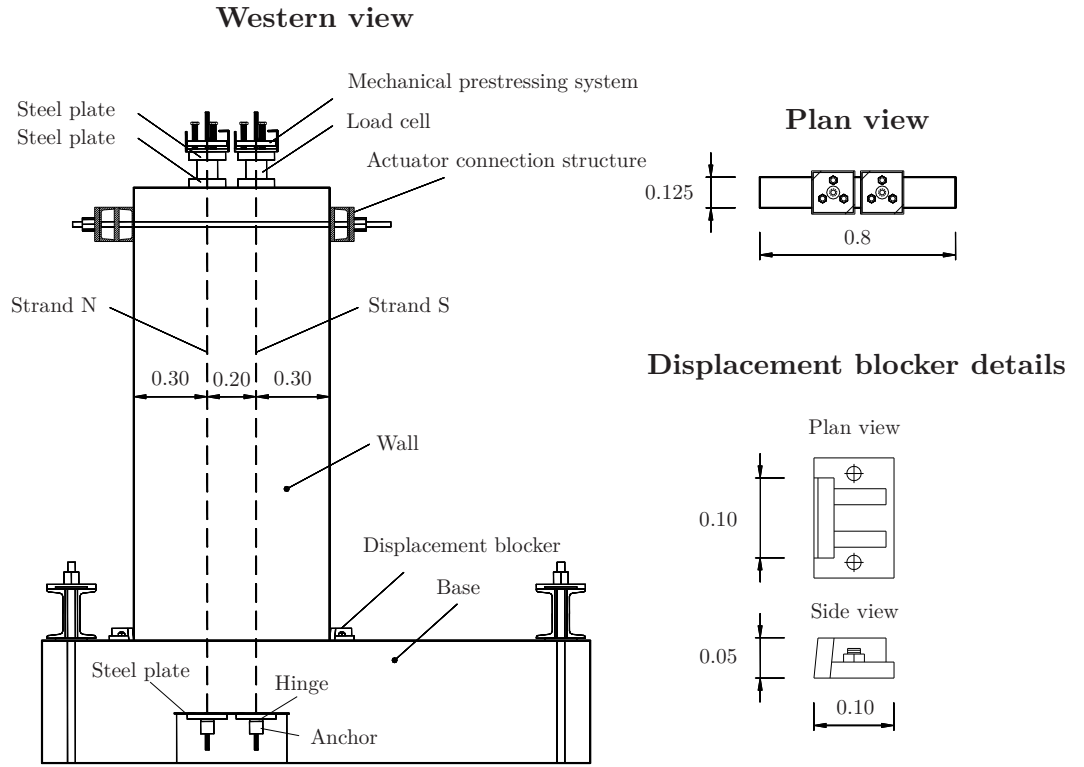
Western and plan views of wall specimen RM1 test setup.
